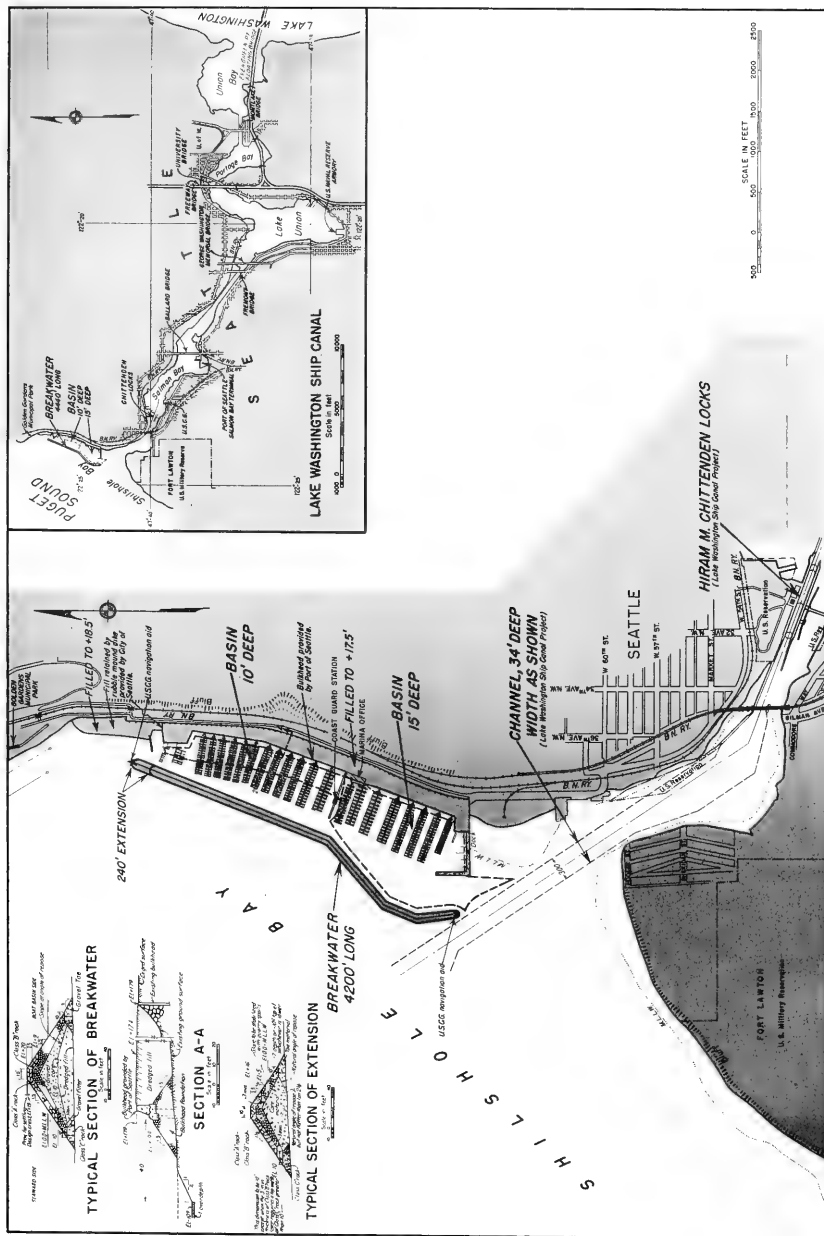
Site layout of Shilshole Bay, Washington (revised 1979)
